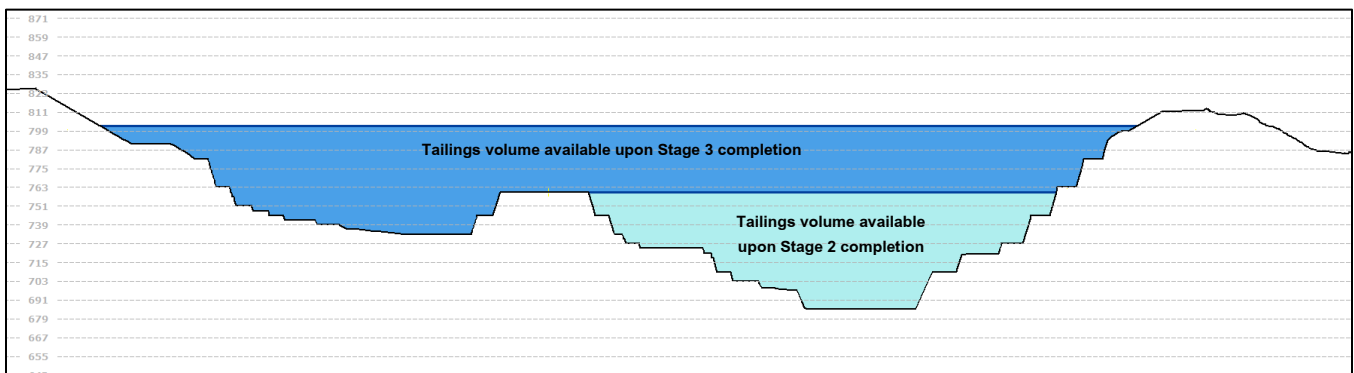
Section through Area 2 Pit showing tailings volume made available with staged mining of Area 2.
